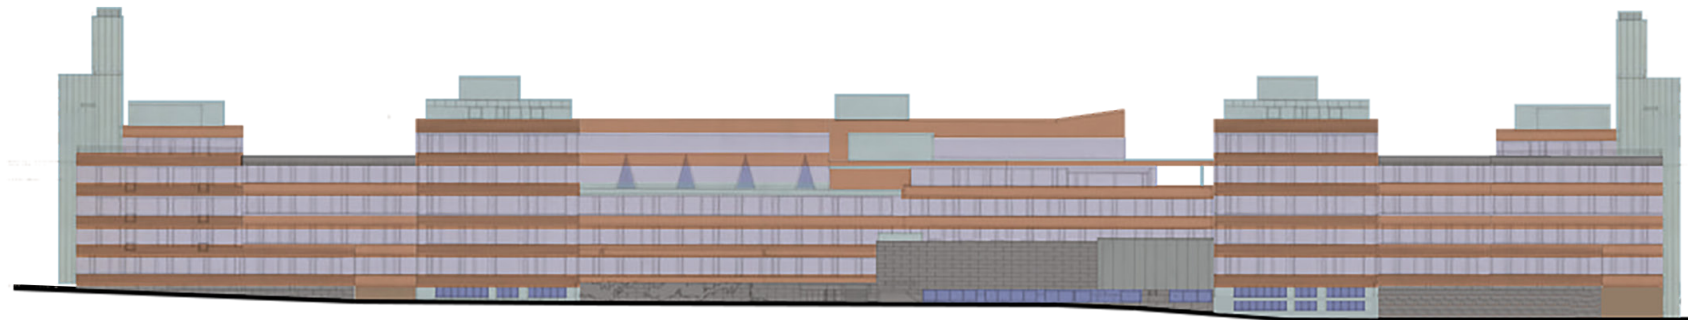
Elevation to the southwest with elongated vertical facade (Alvar Aalto Foundation 1955), altered by authors.
